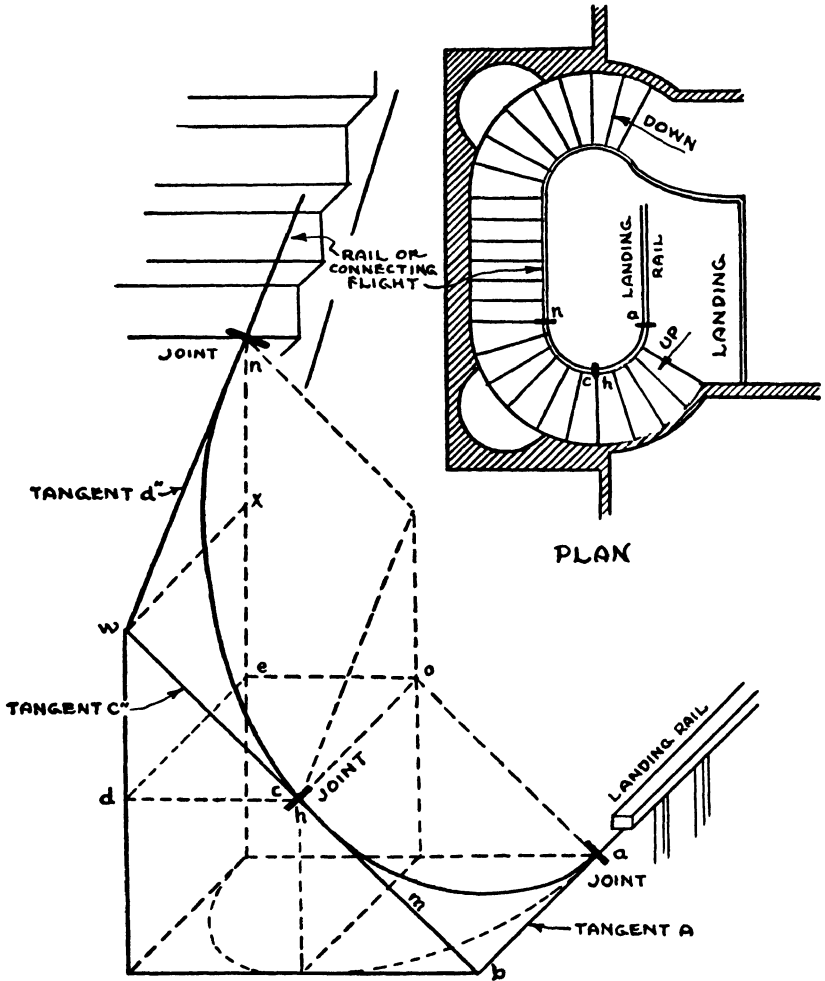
Plan and Isometric View of Handrail Making a Half Turn
